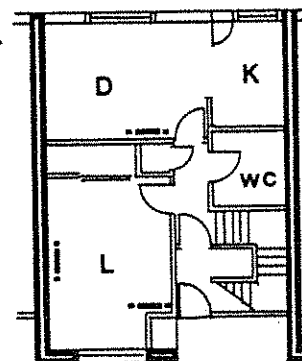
WASHINGTON - 5 PERSON TERRACE HOUSE
